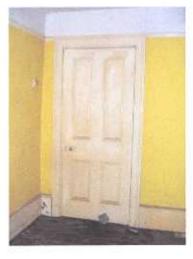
Room 5, 4-panel door with moulded surround, roll-moulded skirting boards and picture ra
